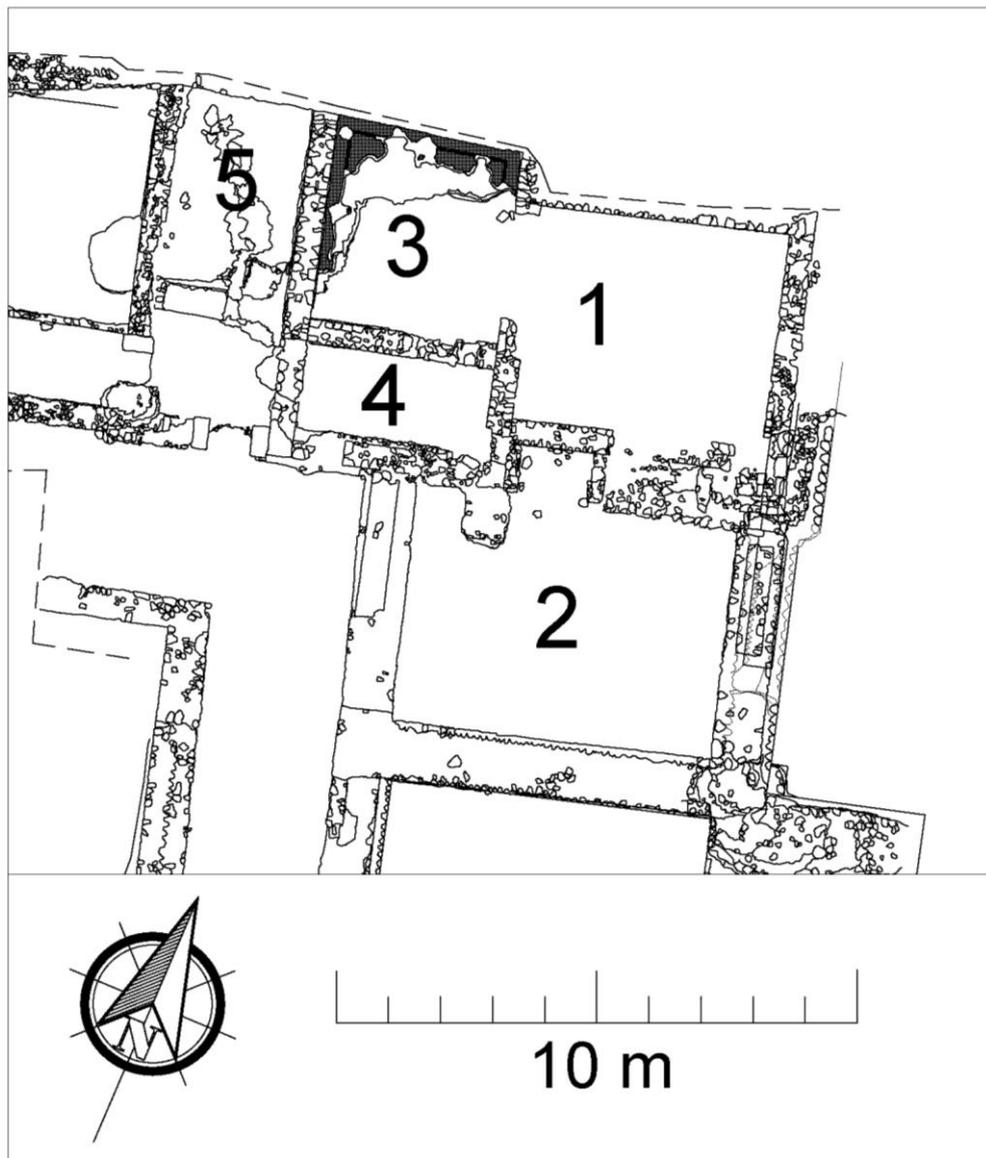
Plan showing Rooms 1 through 5, Villa of Titus, 2022. Plan courtesy of Matthew Munro, University of Calgary.
